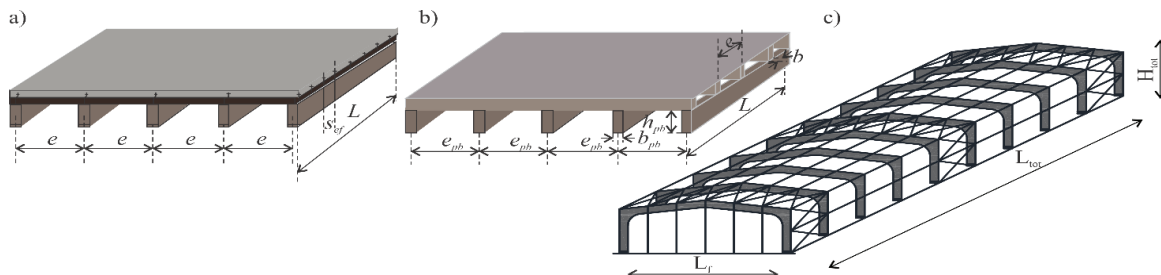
Three timber structures: a) a timber-concrete composite floor; b) a timber floor joist, and c) a timber-steel hall structure.
